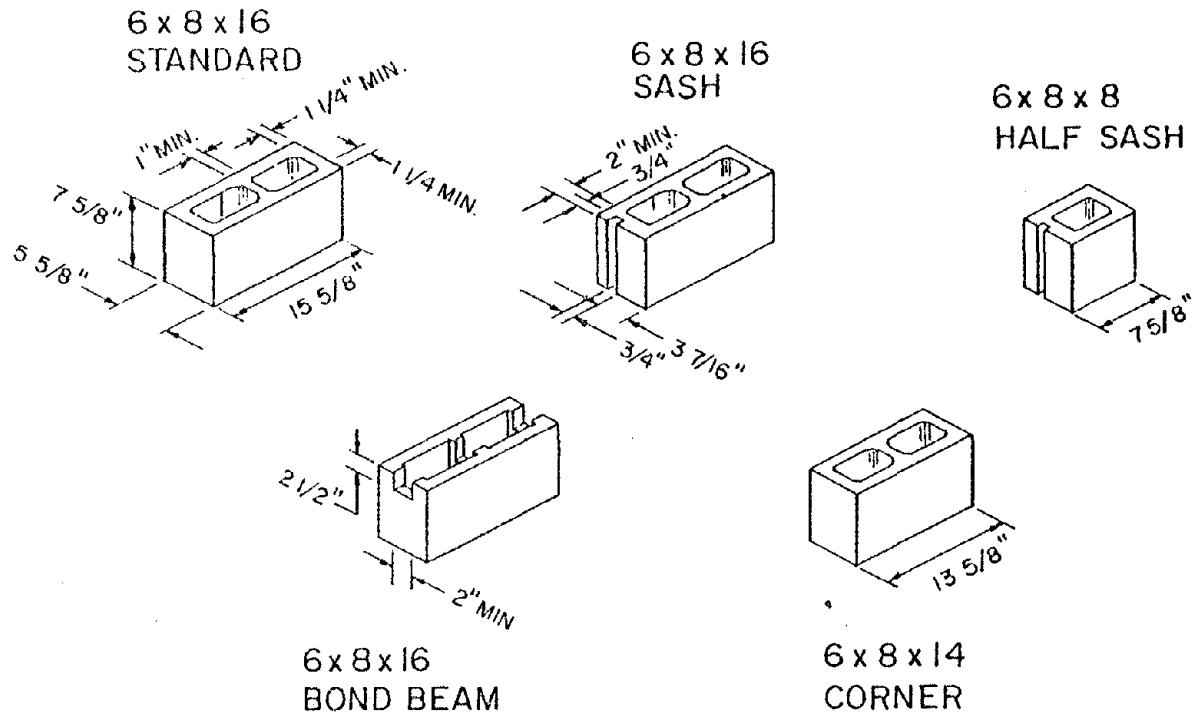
HOLLOW CONCRETE BLOCK UNIT
